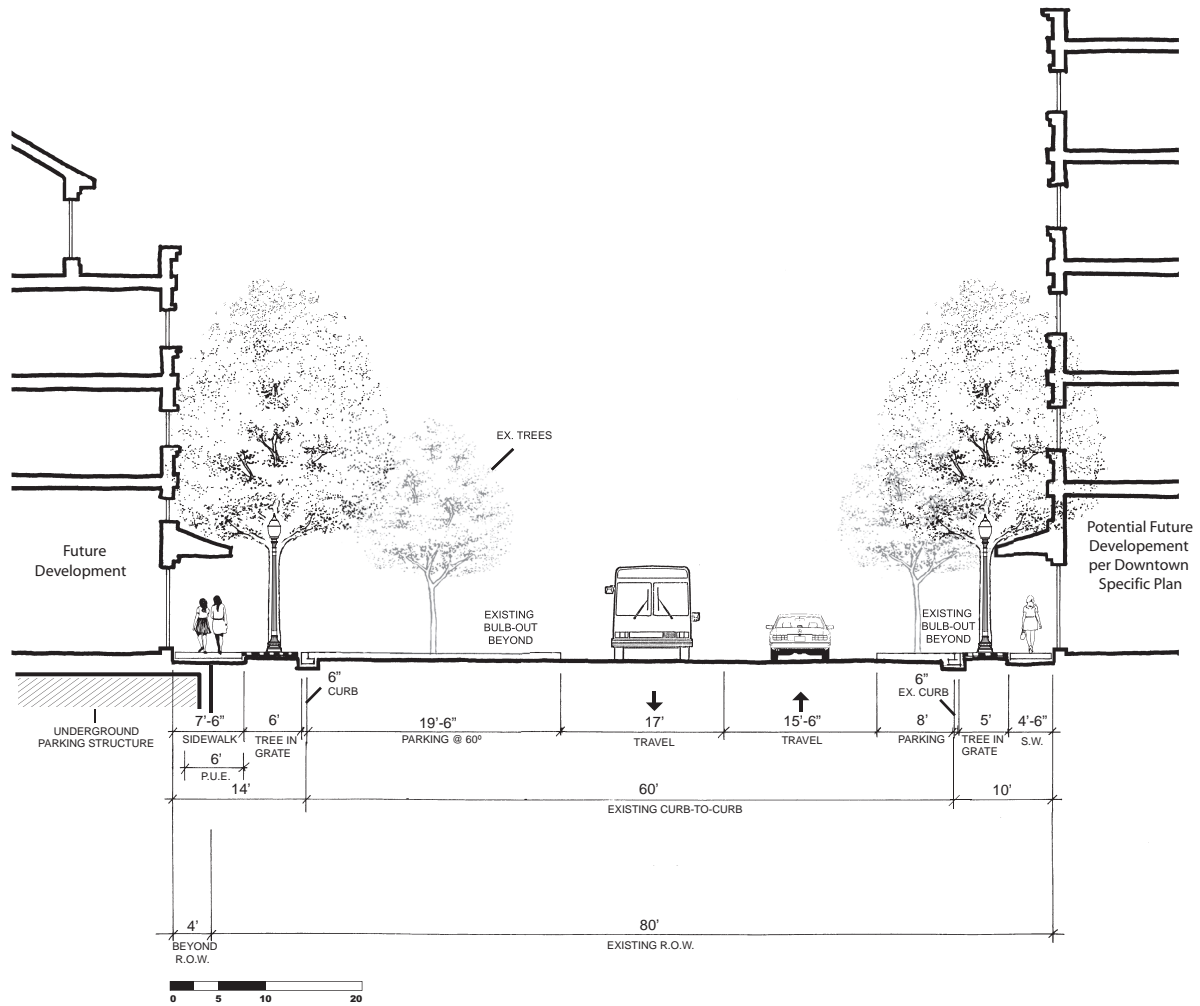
C.37: Santa Clara Street Cross Section (Option 2)
